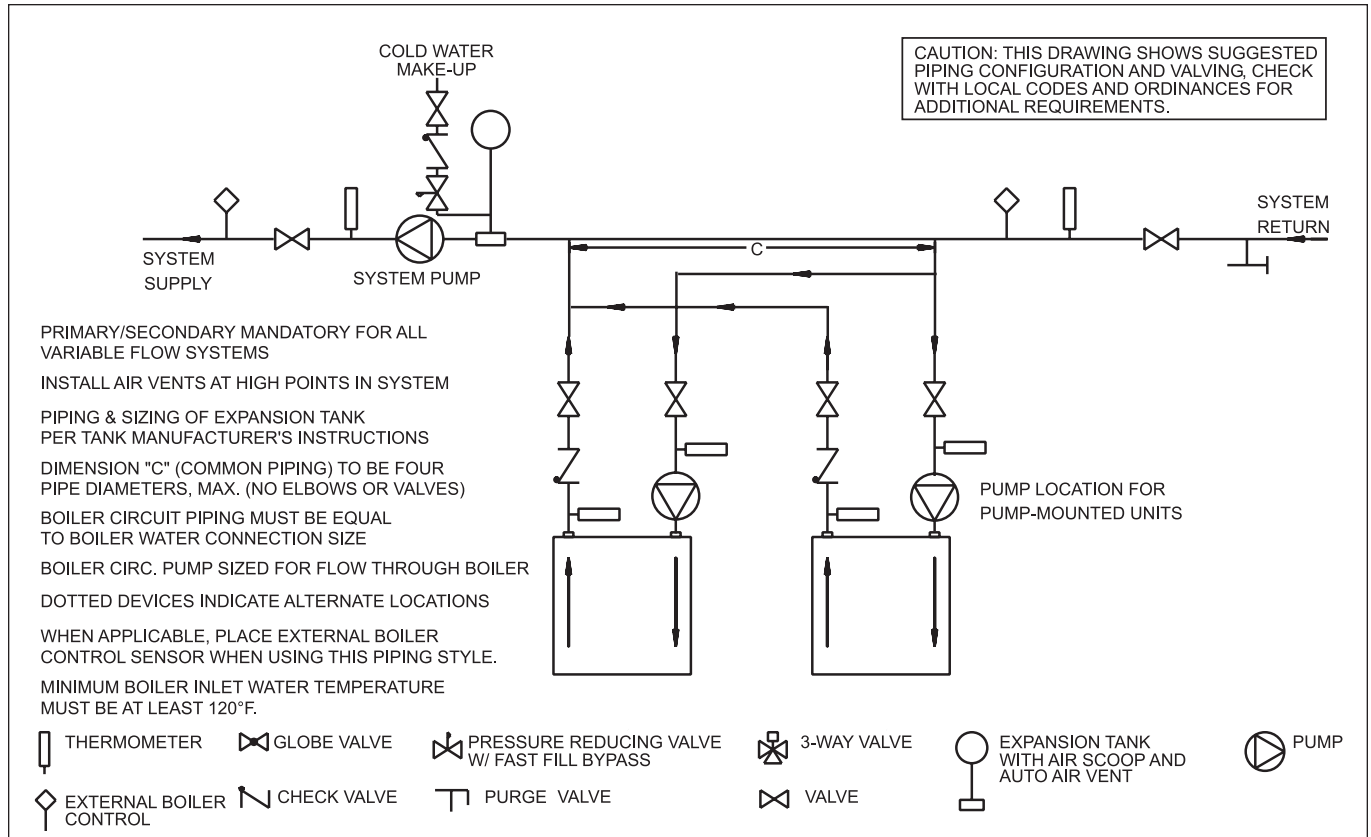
Hydraulic Piping — Primary-Secondary, Reverse-Return.
